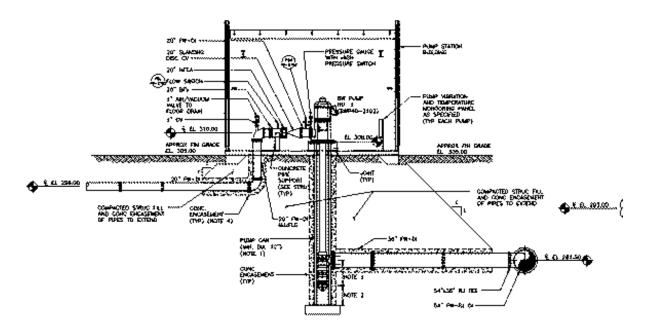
Typical Vertical Turbine Can Pump Section
